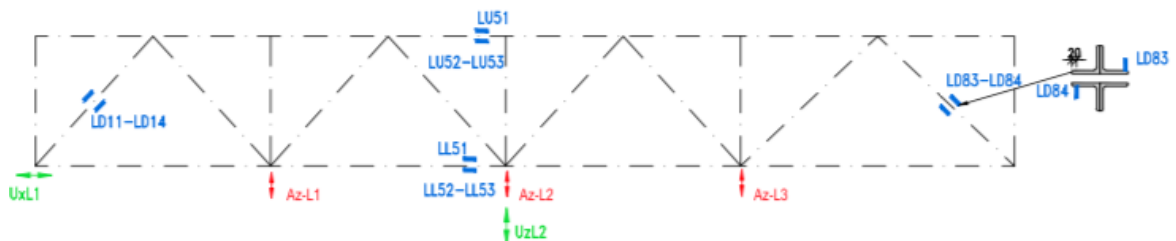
Monitoring Plan: North Elevation or Left Girder (Not to Scale).
